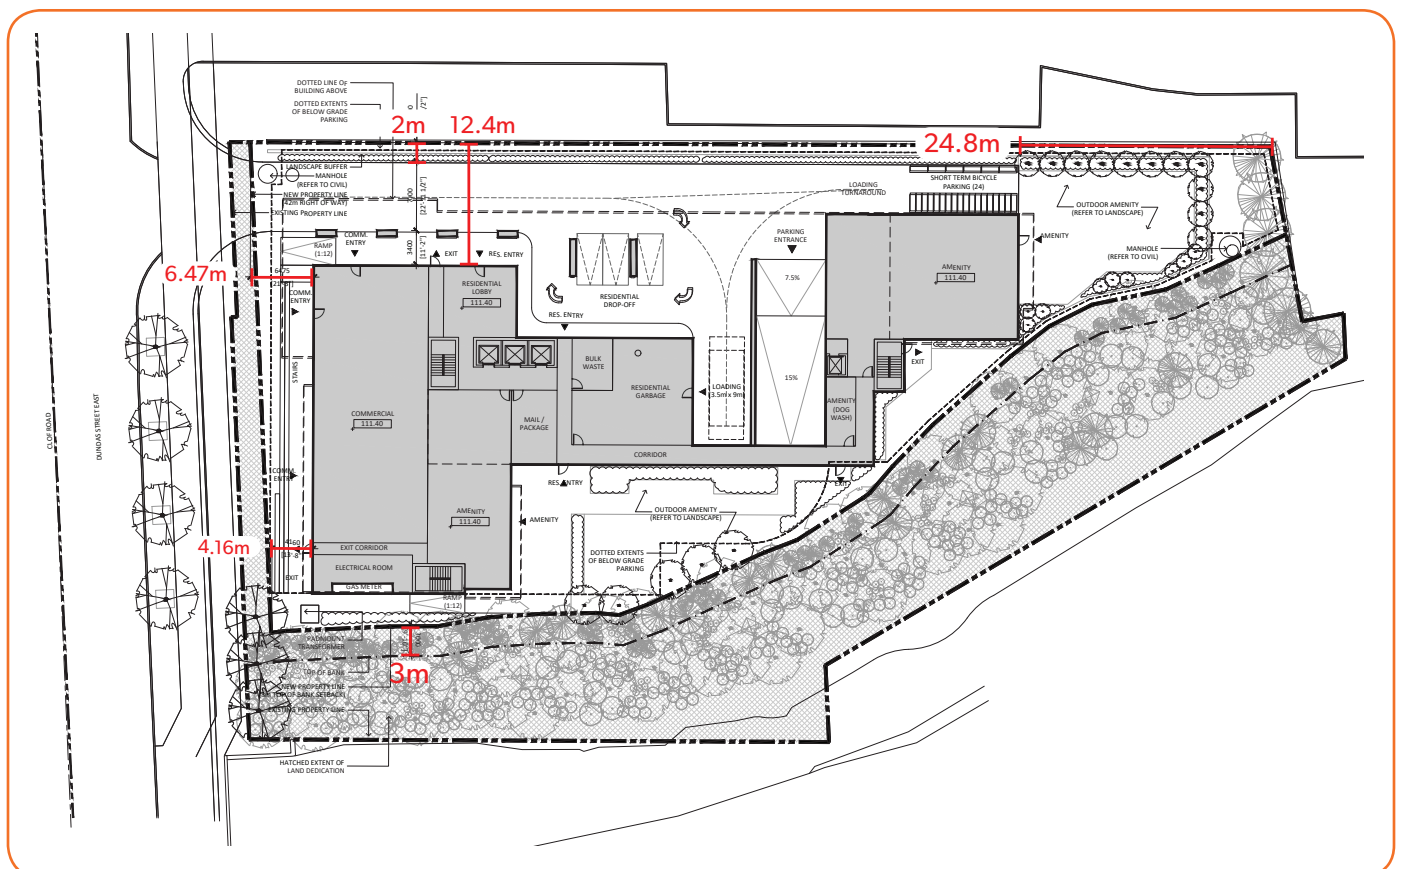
Ground Floor Plan Illustrating Key Setbacks: Prepared by Studio JCI.
